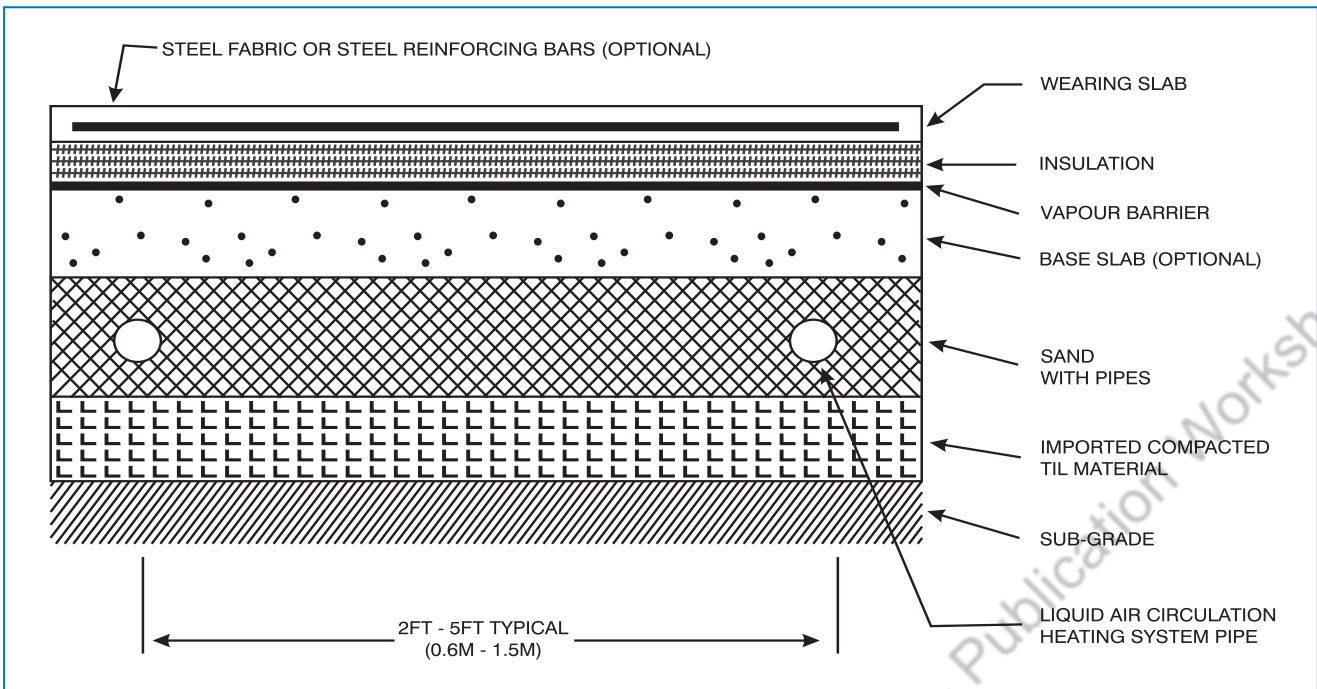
Construction of flooring to prevent floor heaving with glycol circulation
